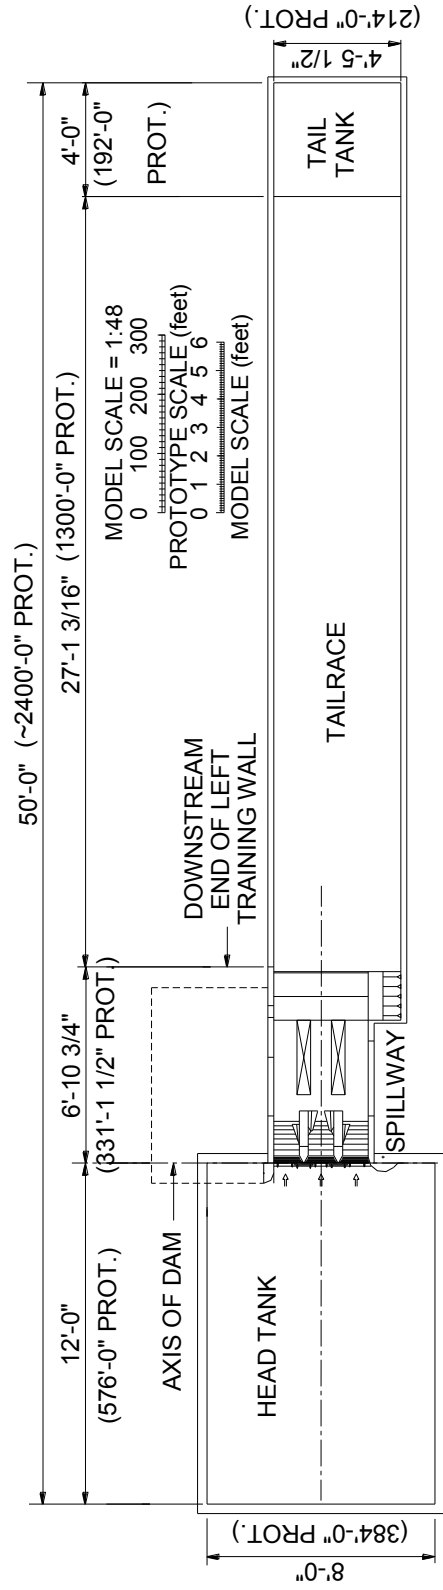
Plan View of 1:48 Two-Dimensional Sectional Model
